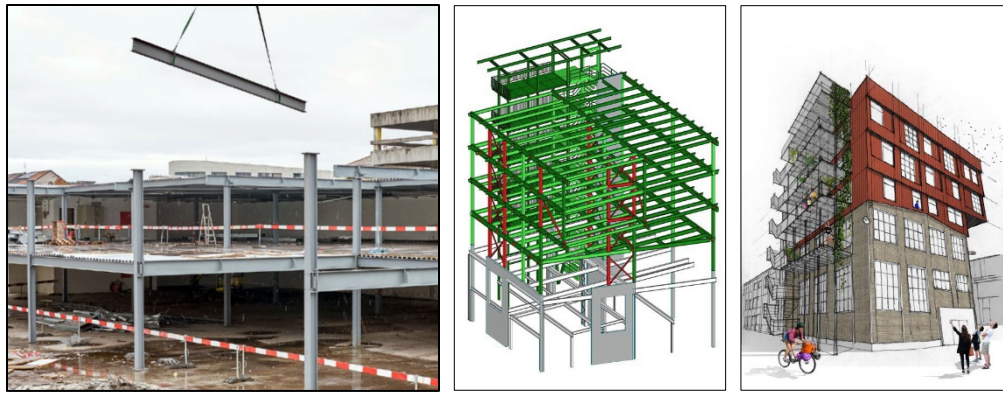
Project for a building extension (Halle 118, Winterthur, CH) sourcing steel beams and columns from a distribution centers. Image courtesy: Baubüro in Situ.
